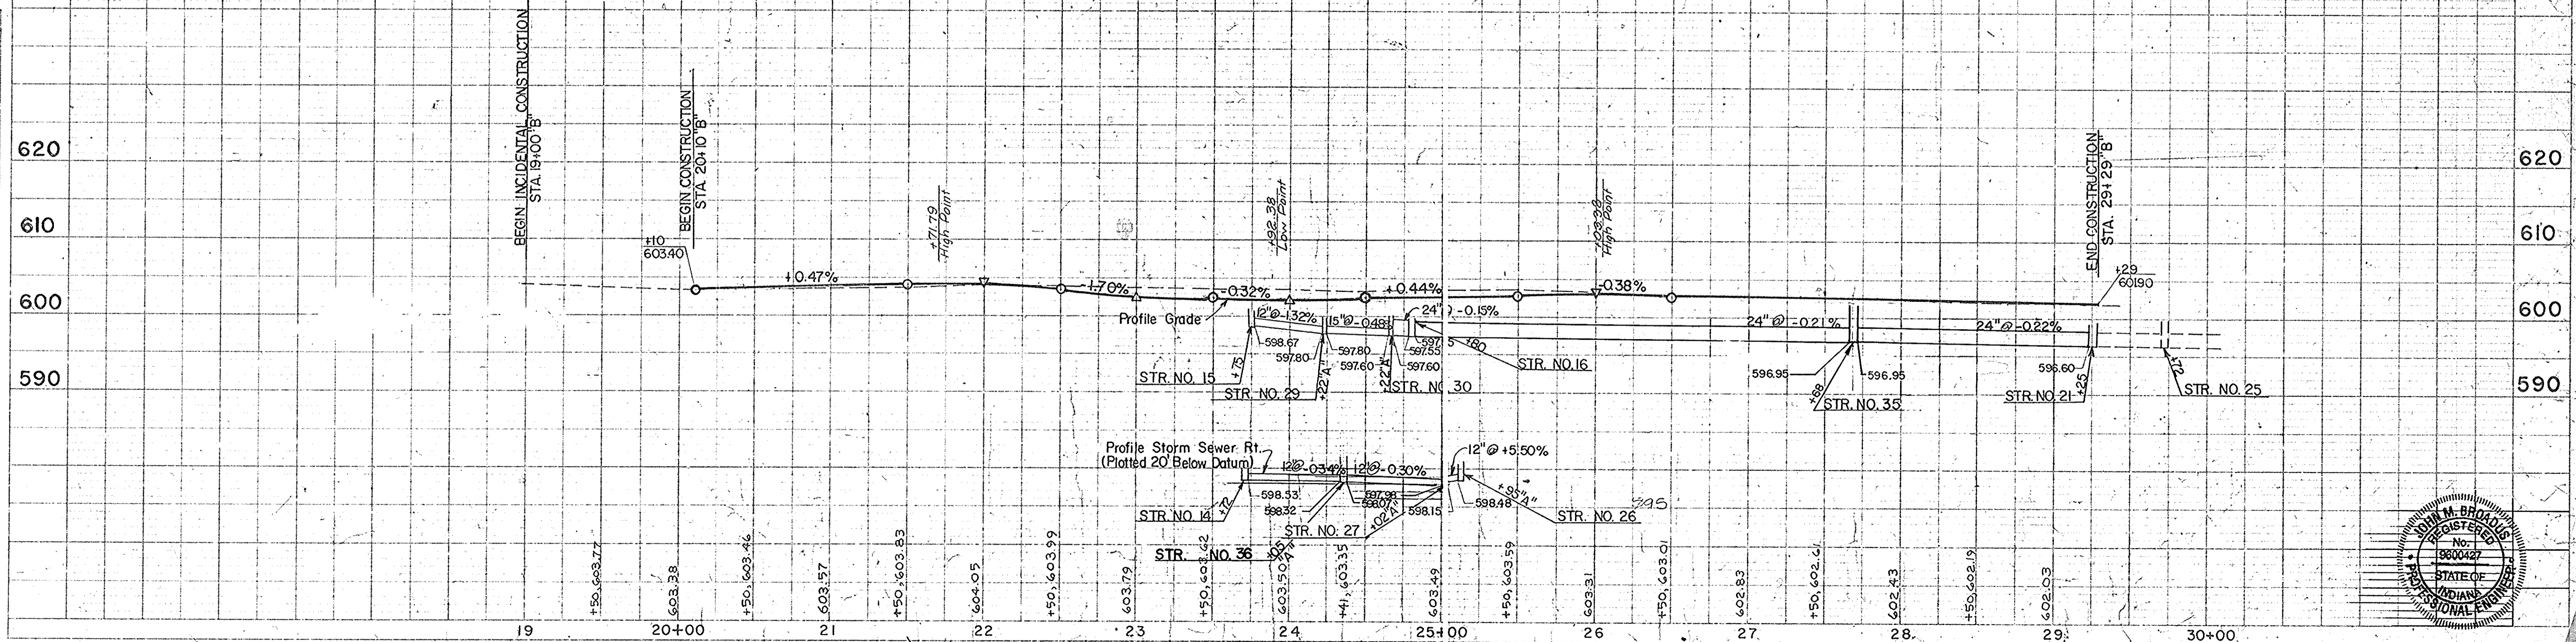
SINGLE PLAN AND PROFILE-FULL LINE
